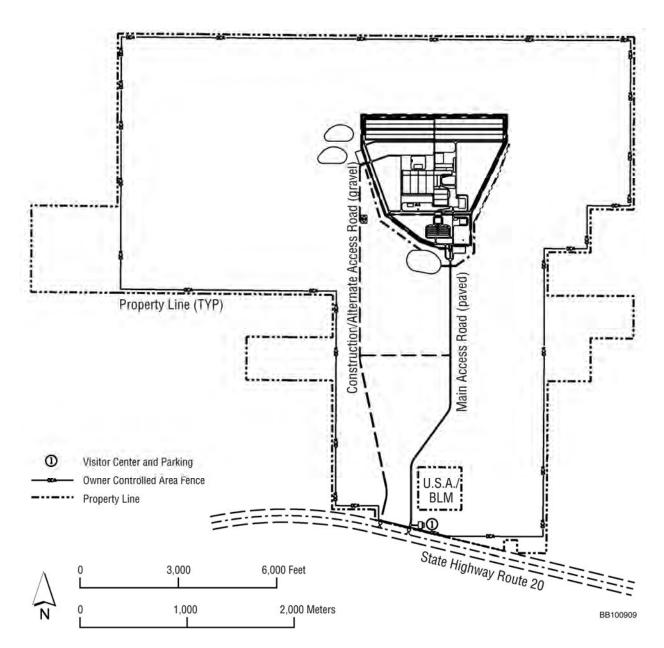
Site Plan for the Proposed Eagle Rock Enrichment Facility (AES, 2010a)
